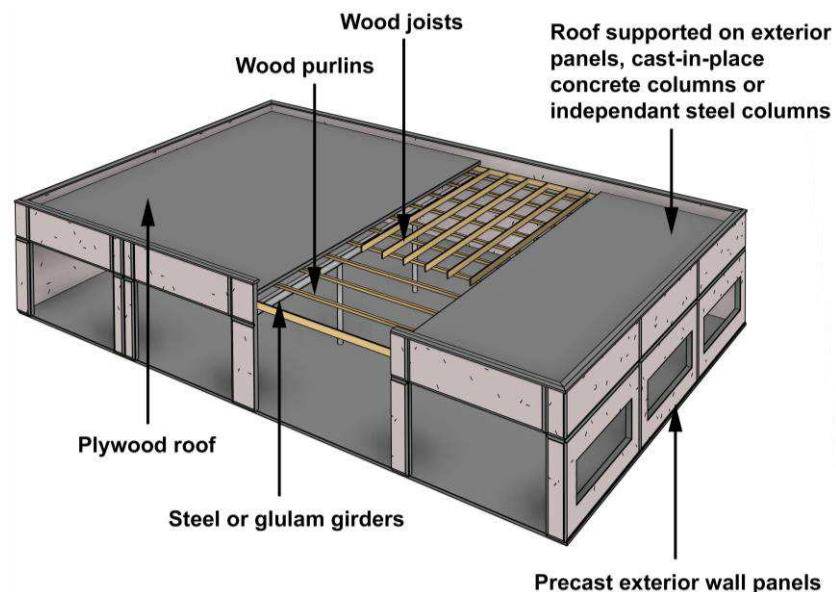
Schematic illustration of a PCW building (Figure adapted from FEMA 547, FEMA, 2006)
